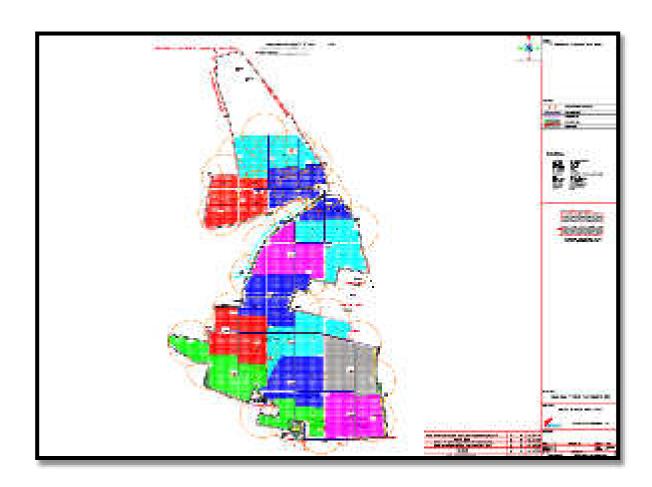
Layout plan of 50 MW solar PV plant at Hindupur
